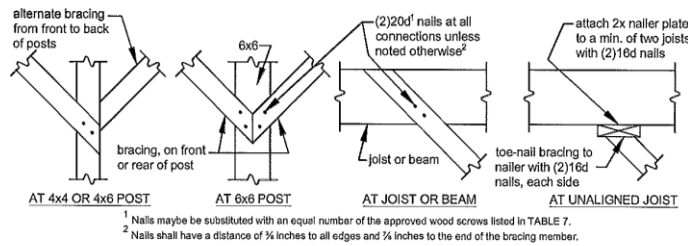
TYPICAL CONNECTIONS OF 2x BRACING
